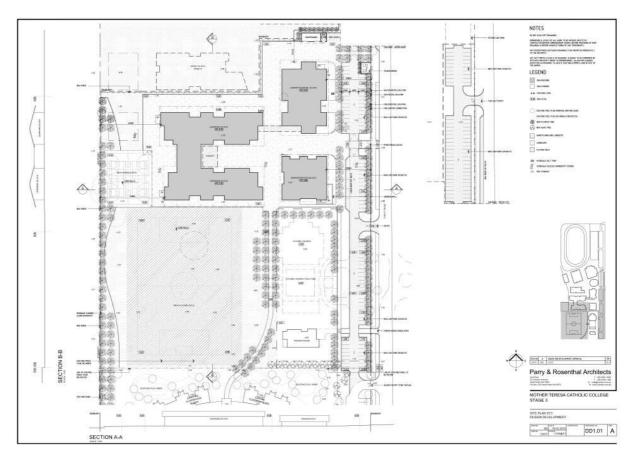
Mother Teresa Catholic College - Proposed Stage 3 Layout
